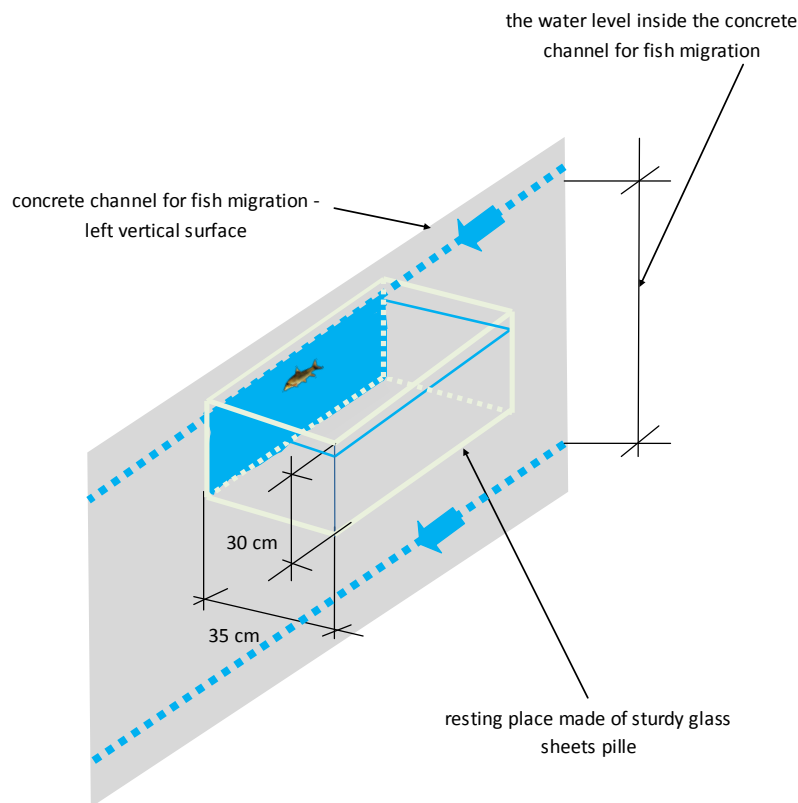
Schematic drawing showing a resting space for fish - indicative figure.
